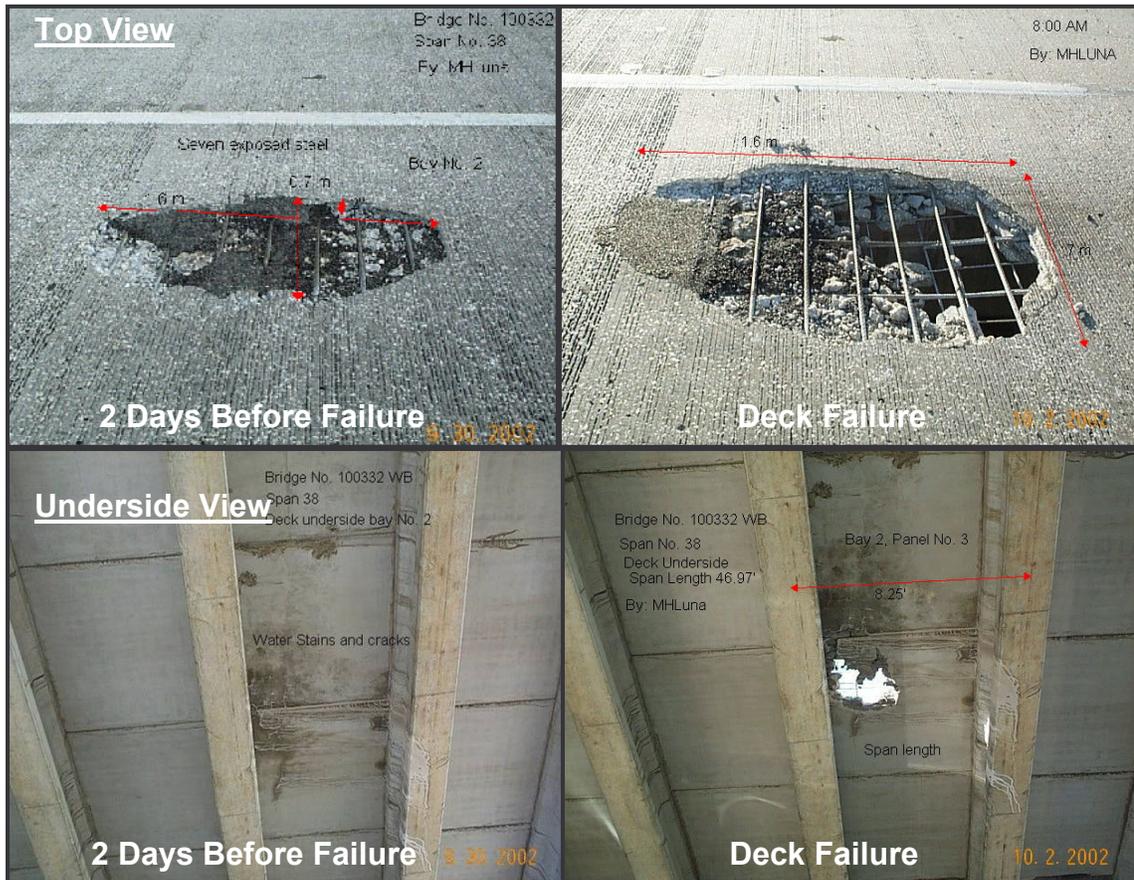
Localized Deck Failure. Bridge #100332, Span 38
